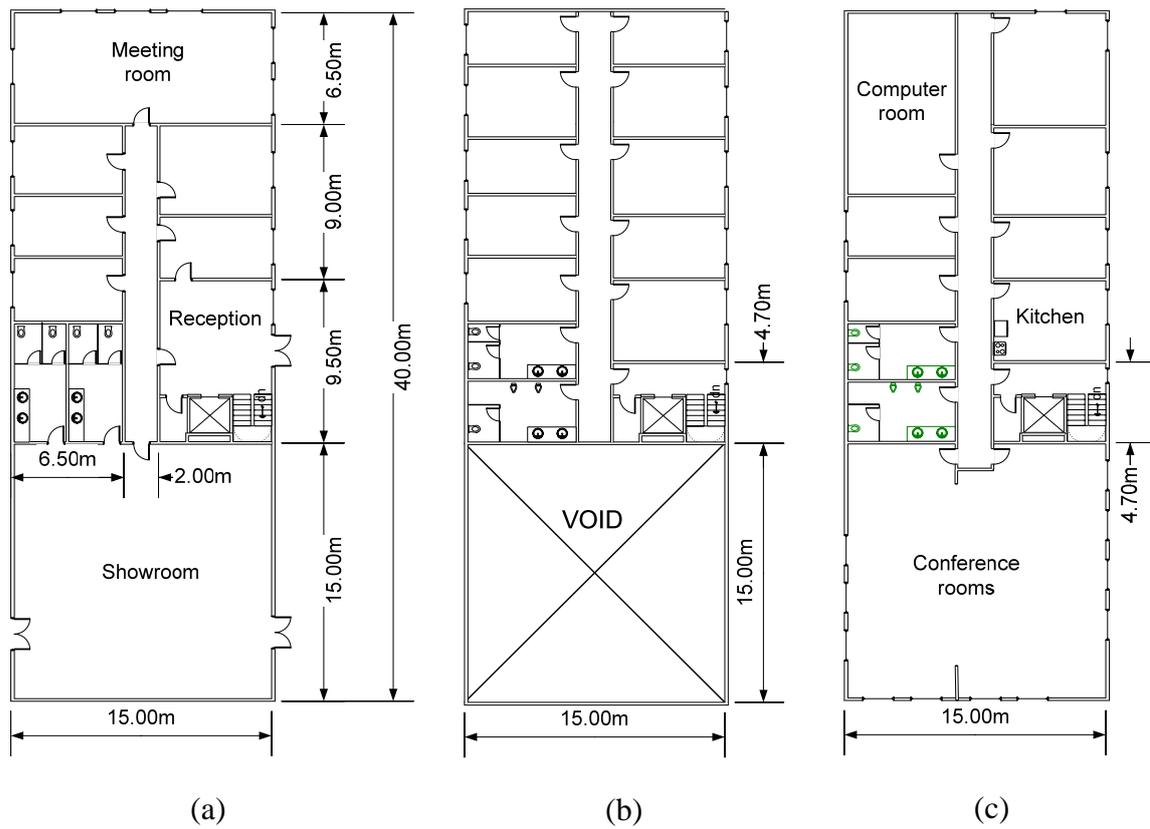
Hypothetical 3-storey office building (a) Ground floor (b) First floor (c) Top floor. Unlabelled rooms are offices or toilets.
